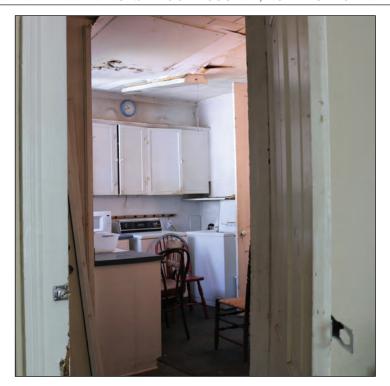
Hugh A. Keith House, Added Kitchen.
